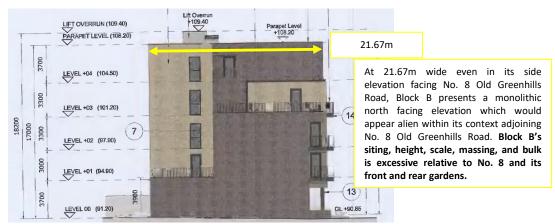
THE NORTH ELEVATION OF BLOCK B WHICH FACES NO. 8 & ITS FRONT AND REAR GARDENS
